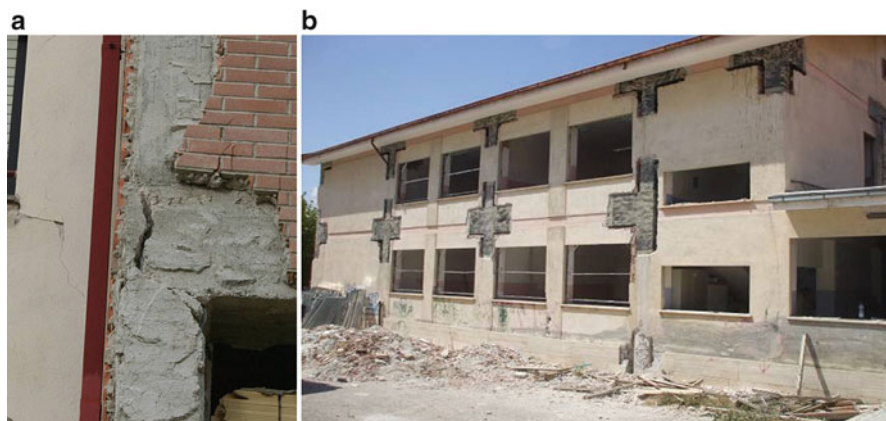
(a) Joint failure; (b) FRP strengthening on an elementary school in Paganica, L'Aquila
